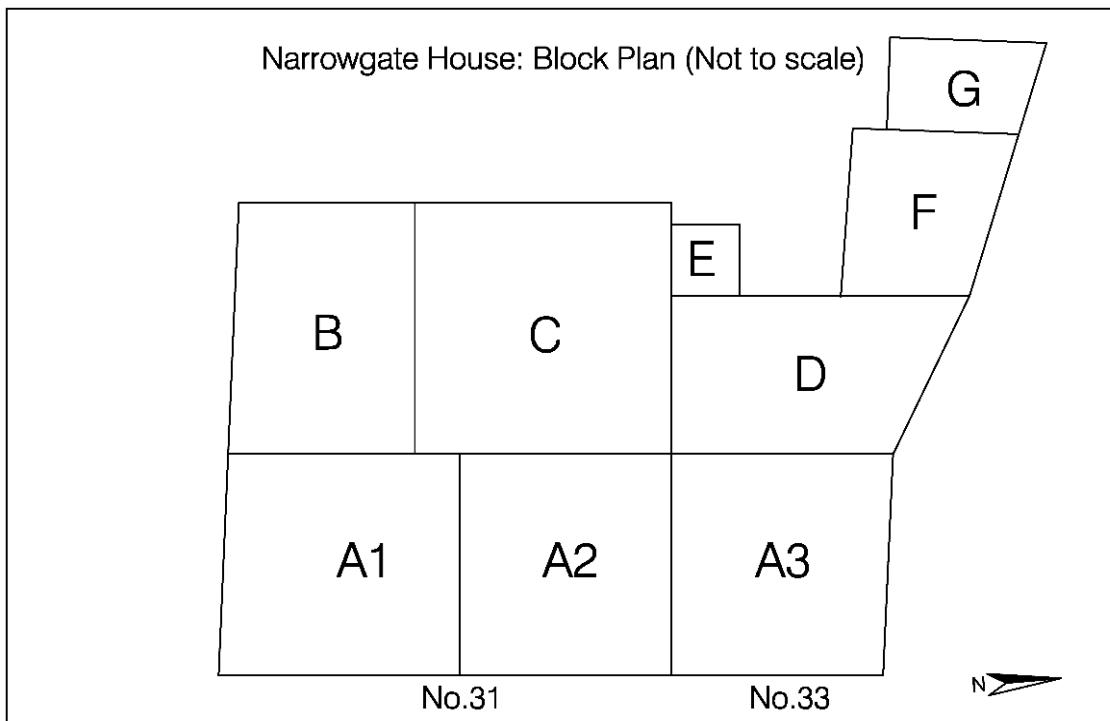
Schematic block plan of Narrowgate House showing the principal structural units. These do not necessarily equate with phases of construction.
